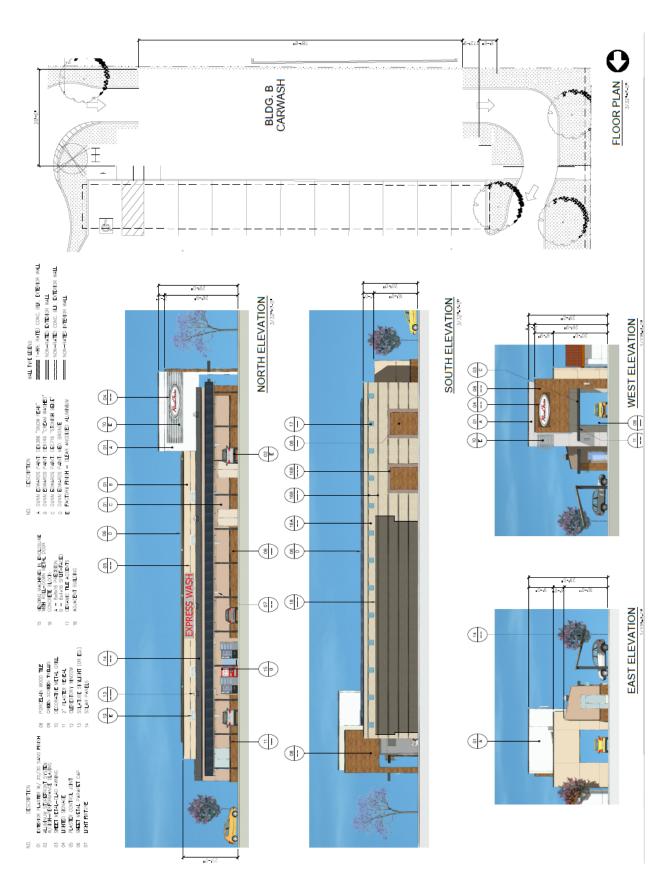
FLOOR PLAN & ELEVATIONS Car Wash & Retail Store CUP NO. 2019-30, CUP NO. 2019-31, VAR NO. 2018-10 301 and 325 North Tustin Avenue
